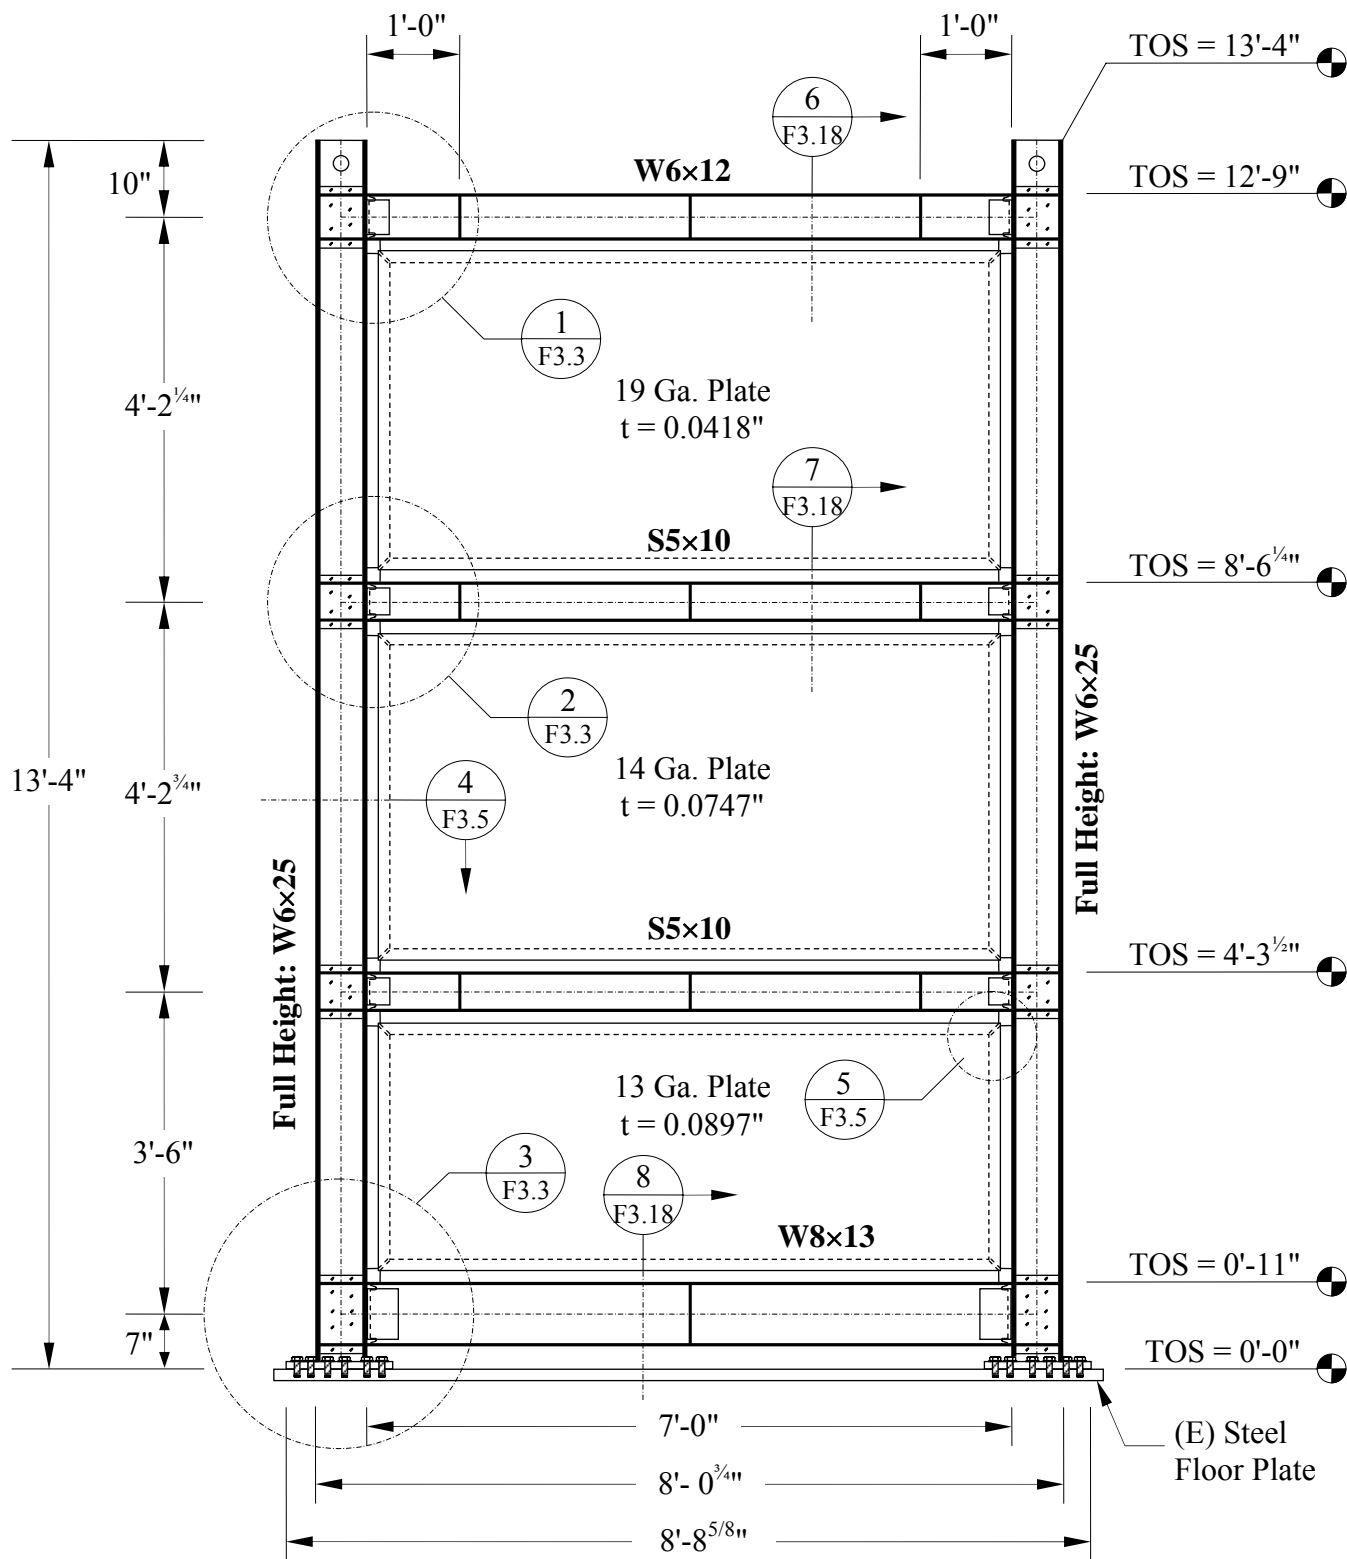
Elevation View of Three-Story SPSW Specimen
